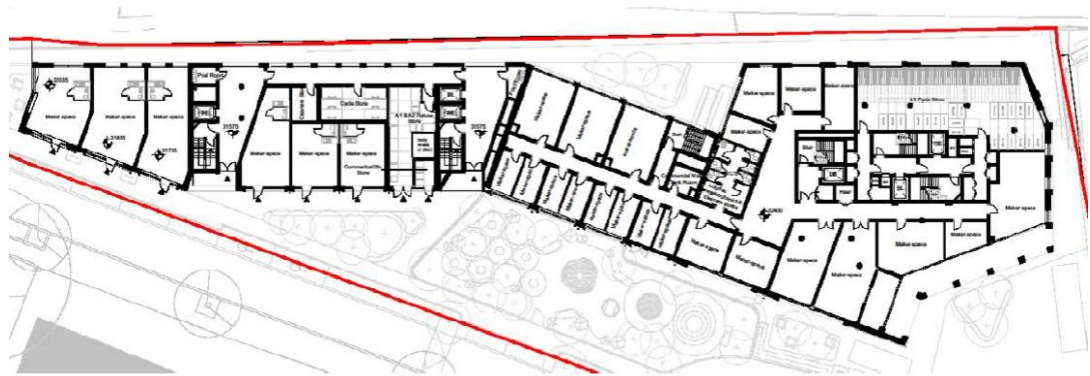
Floorplan showing location of cores (to right, centre and left)
